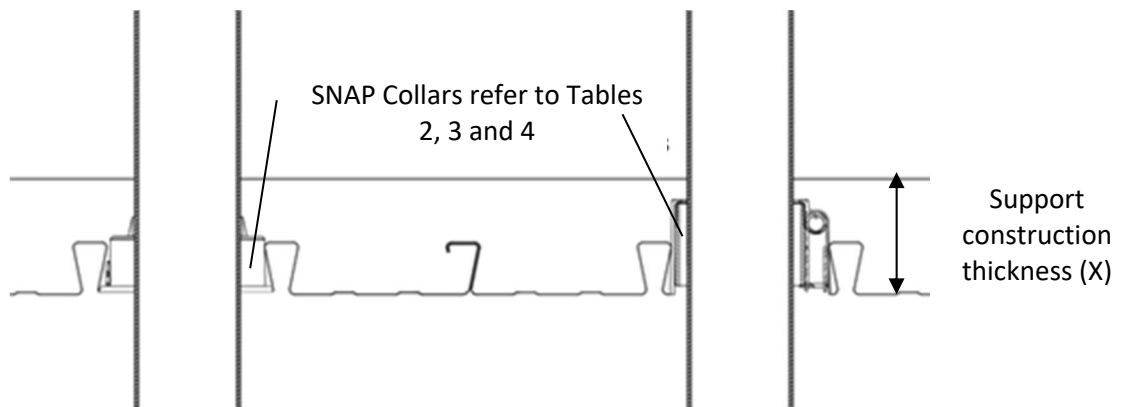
An example of the installation of SNAP collars in concrete with steel permanent formwork slab – active area of the collar $< 40\text{mm}$ from edge of rib. For this installation it is required the structural adequacy of the steel permanent formwork be verified by others. Refer to Section 7 of this report.
